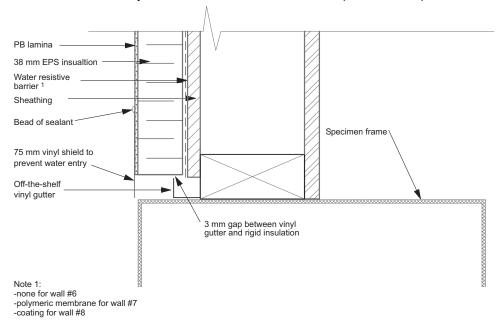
Termination detail at the bottom of the wall for specimens No. 6, No. 7 and No. 8
